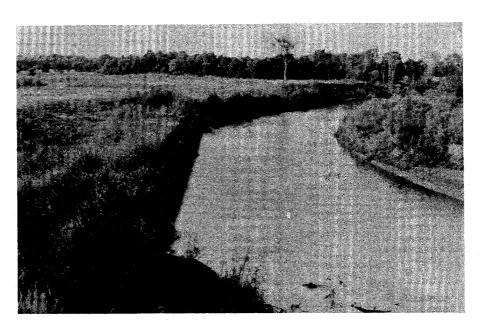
Timber-pile retard, at bend in channel upstream from bridge. (Washita River, Okla., Site 115.)
